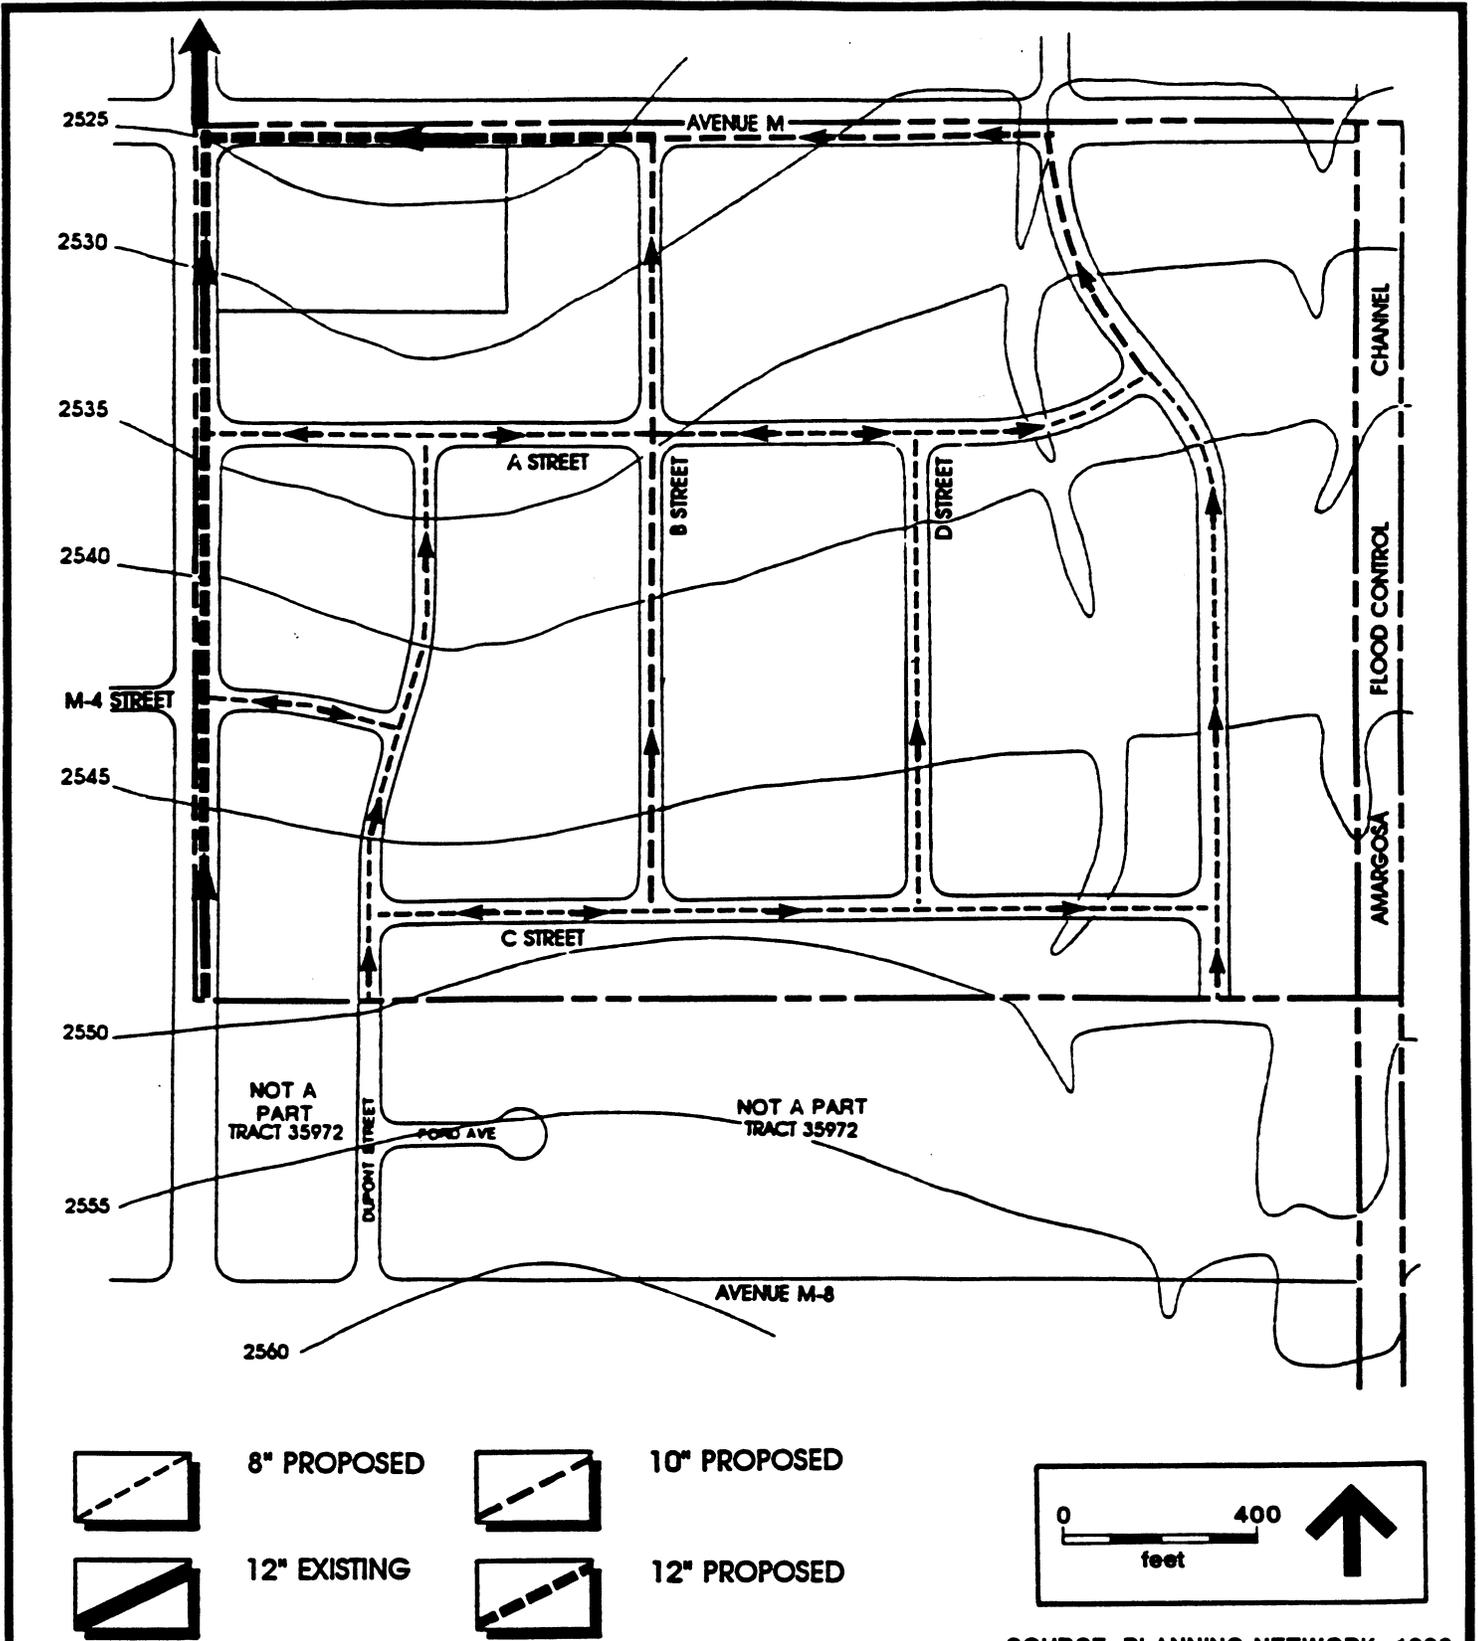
SEWER PLAN FOR ANTELOPE VALLEY BUSINESS PARK
